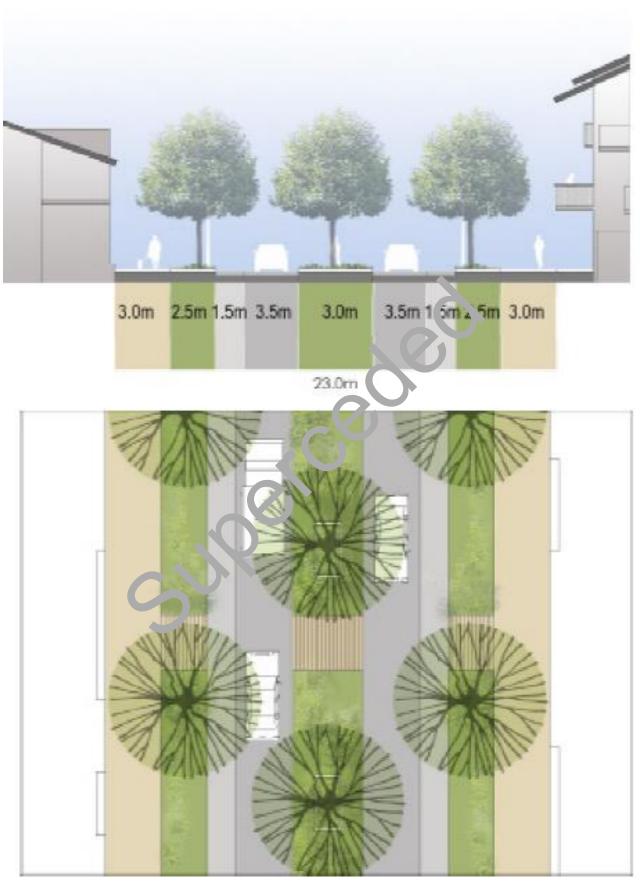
Link Road (Urban Boulevard) cross section and indicative plan
